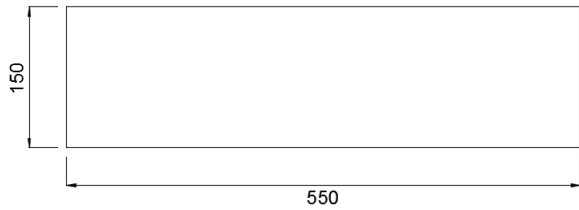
Flexural-Shear Stress Test Specimen (unit:mm)
